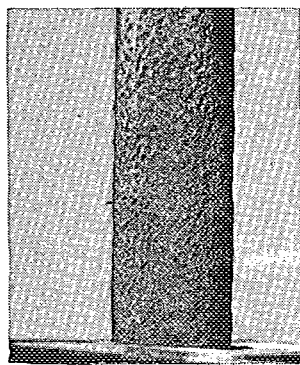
(right) — Severe Pitting of a Gas Line Exposed to Spray from a Cooling Tower
